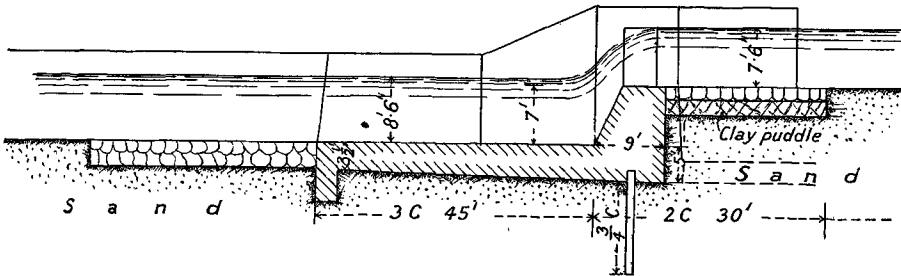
Alternative Design of Jamrao Canal Fall.
